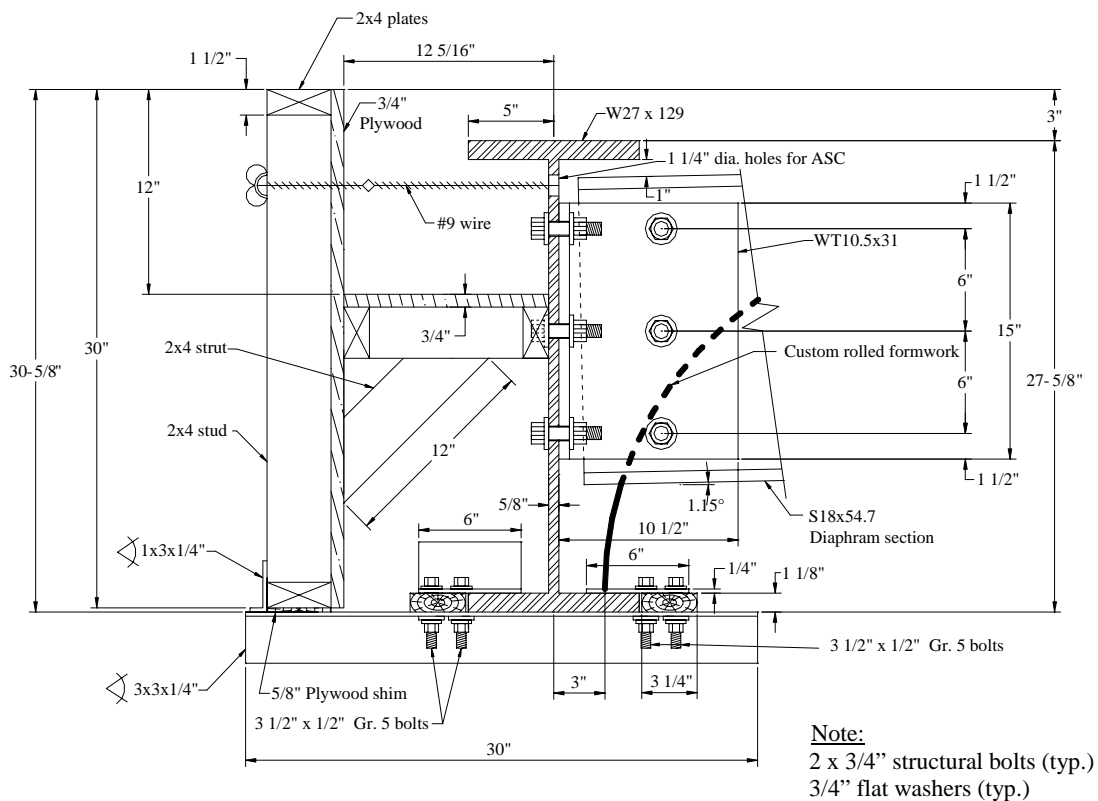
Installed exterior support and formwork used in MBISB 2.
